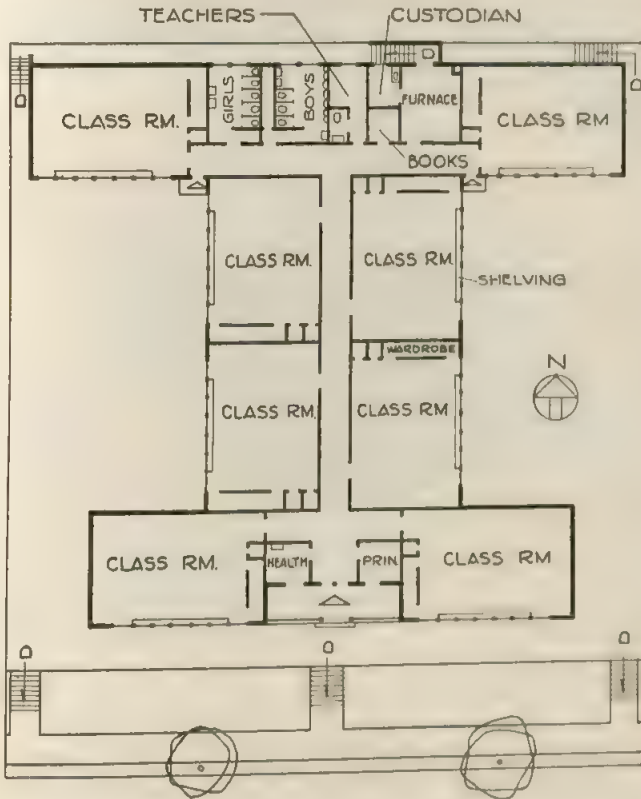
Floor plan of the Cole Branch Primary School, St. Louis, Mo. Courtesy of *American School Board Journal* and F. Ray Leimkuehler, supervising architect, St. Louis Public Schools.
